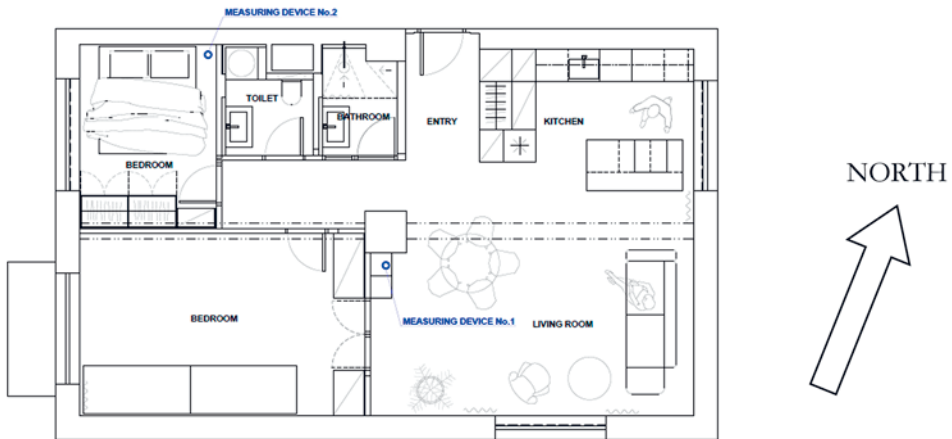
The floor plan of measured apartment with location of measuring devices.
